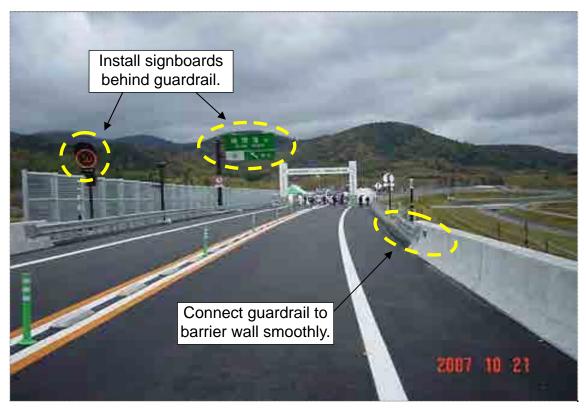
Arrangement View of Traffic safety Facilities (1)
